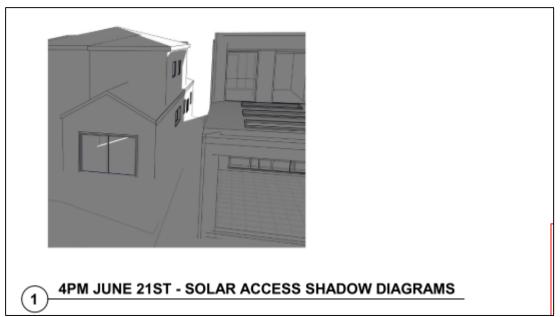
Shadow on elevation plans depicting extent of overshadowing to southern adjoining property.
